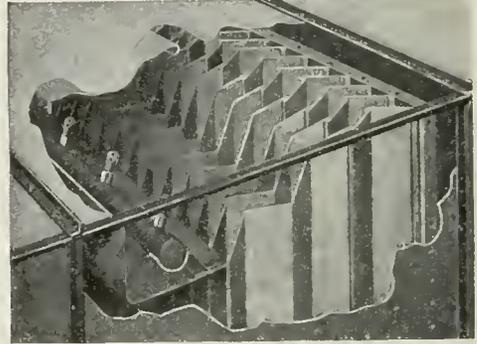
Sectional View of a Filter showing spray nozzles and eliminators
